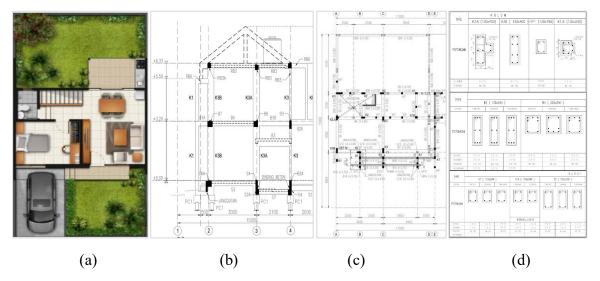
Case study typical house data (a) typical architect's plan, (b) building cut, (c) typical structural plan, (d) typical structural details
